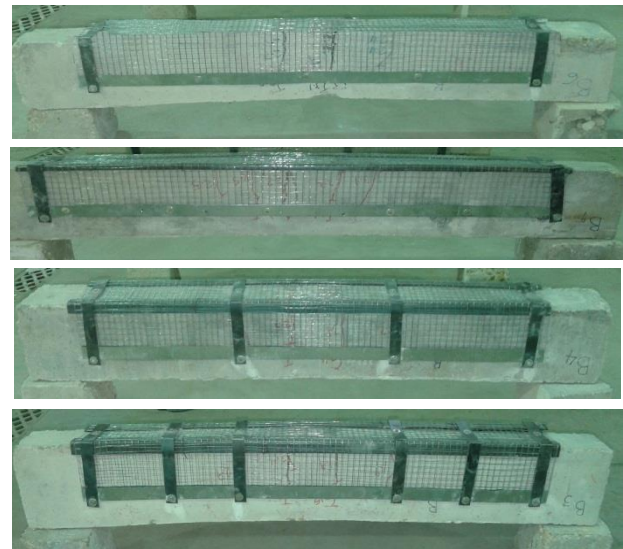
Expanded galvanized steel wire mesh with and without two longitudinal steel angles were used at the bottom corners of beams fixed to beams with 2, 4 and 6 clamps and bolts.
